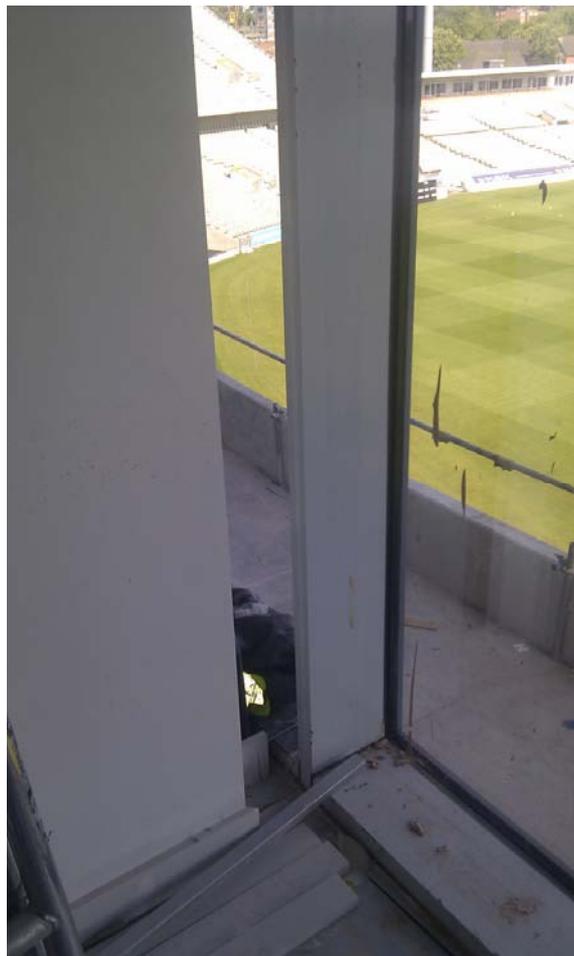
Gap between mullion and wall requiring encapsulation in the bespoke glazed wall system.
